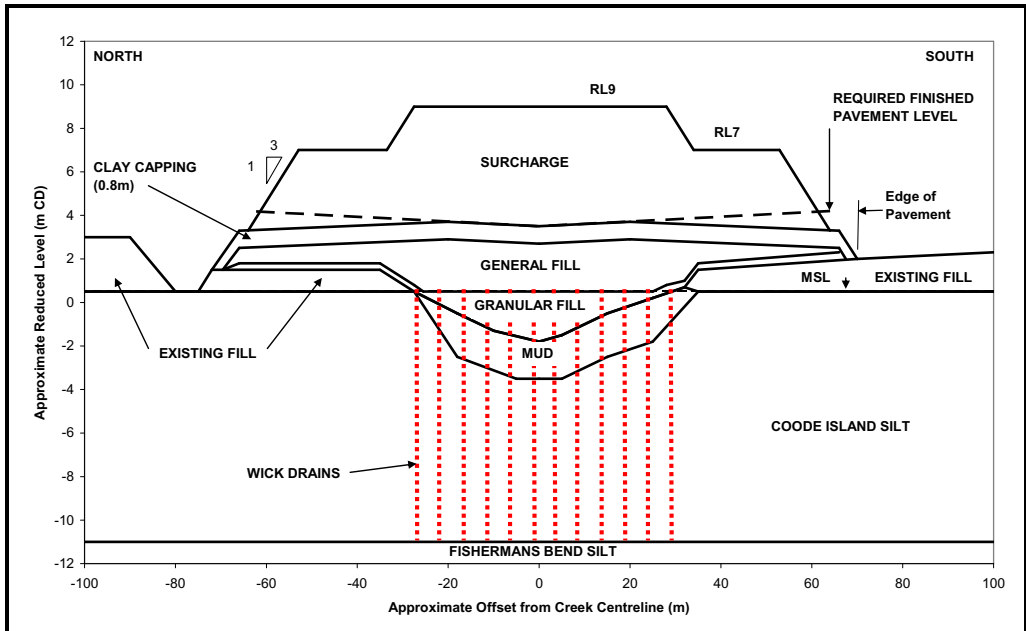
Idealised cross-section through reclamation showing wick drain and surcharge
